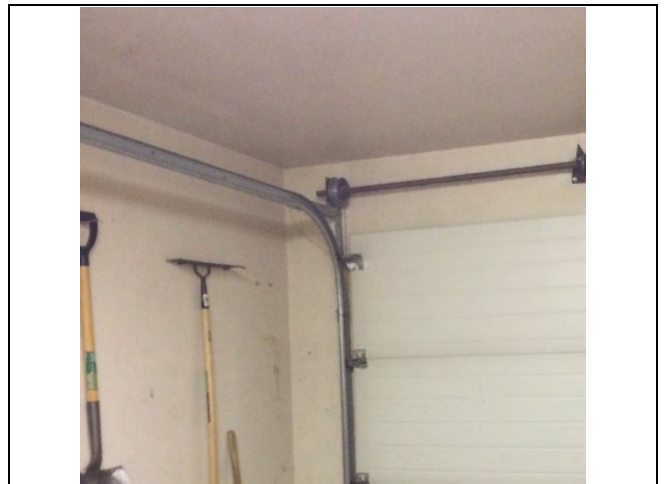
Asbestos-containing drywall joint-fill compound (1% Chrysotile) on the walls and ceiling in the garage.
